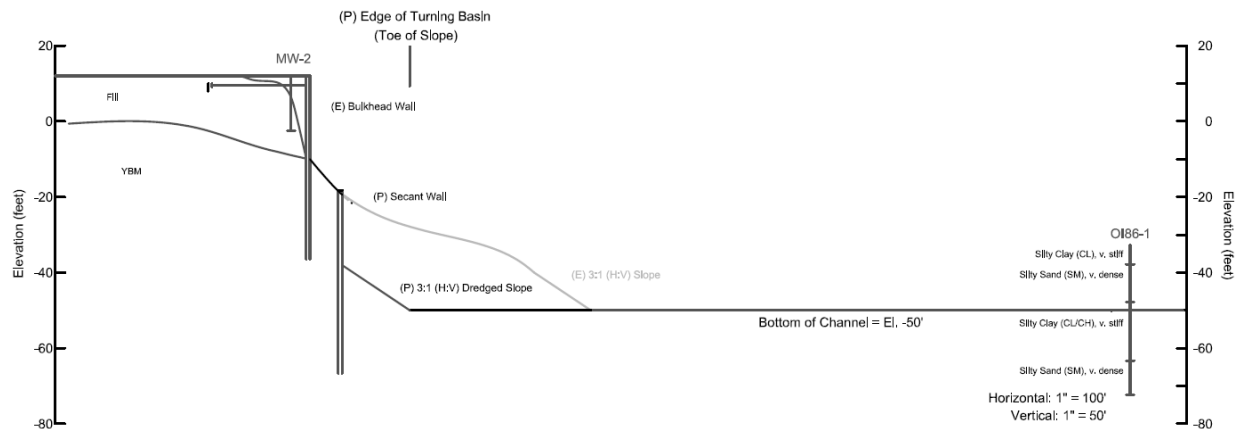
Schnitzer Steel Cross-Section C-C'(Proposed)
